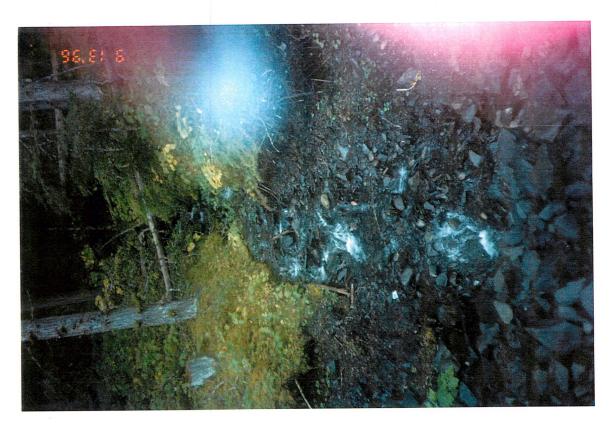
, 13-Sep-96 Site #: A15, Looking u/s from culvert.
